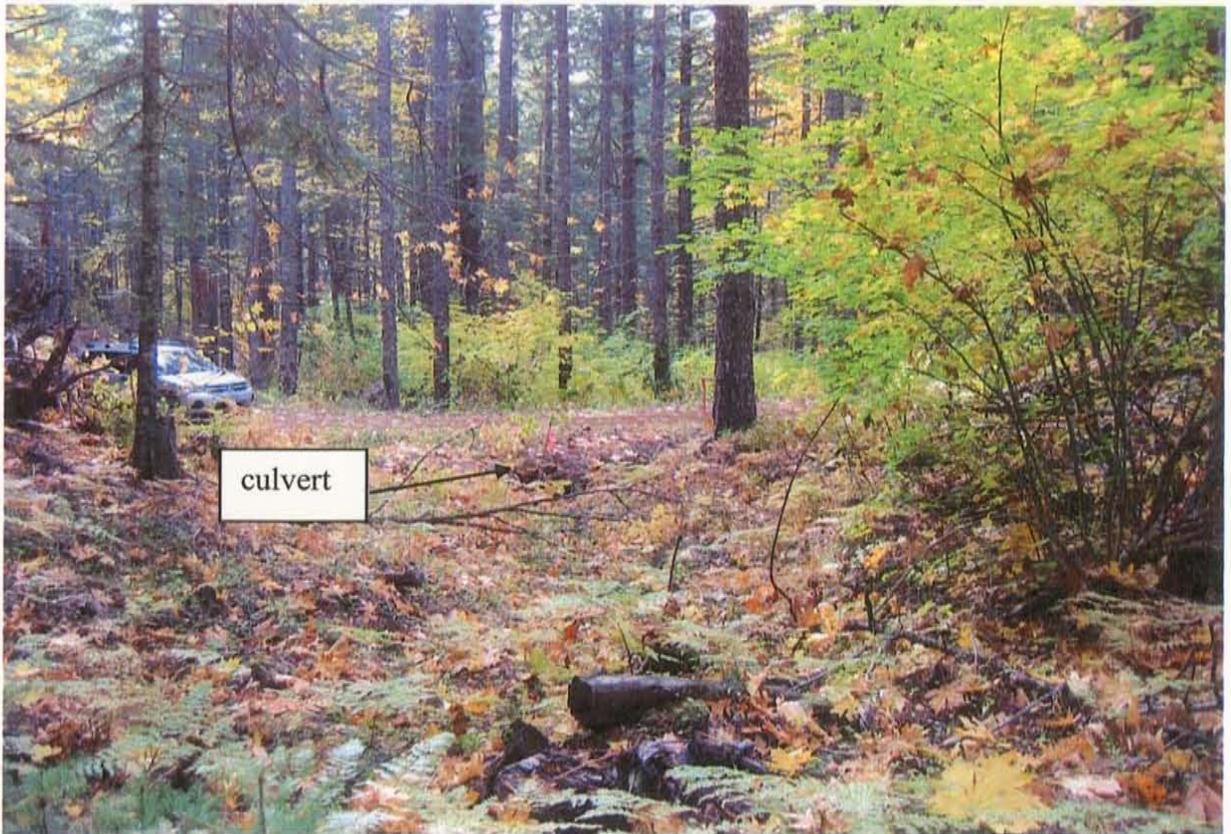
Looking south downslope approximately 100 feet above road. Culvert inlet is at pink flag. 10/26/06.
